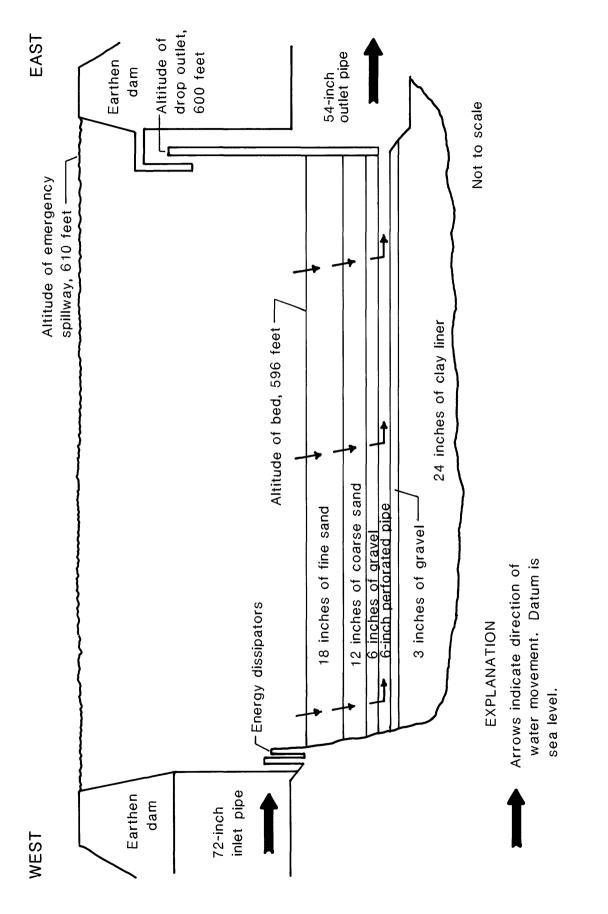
Schematic cross section of Pond 1 at Barton Creek Square shopping Center
